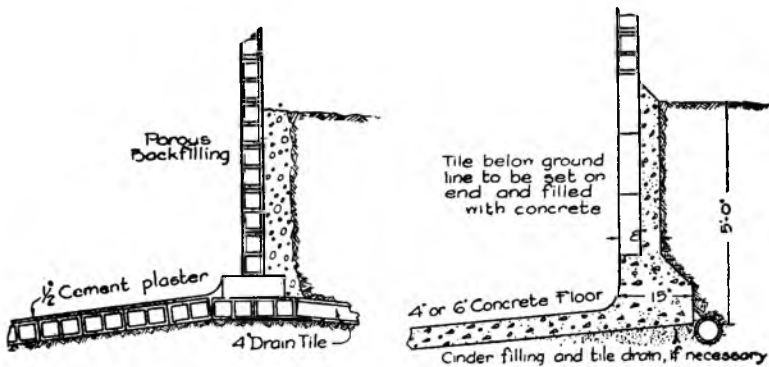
Foundation at left constructed entirely of clay blocks. Foundation at right constructed of blocks and concrete.
